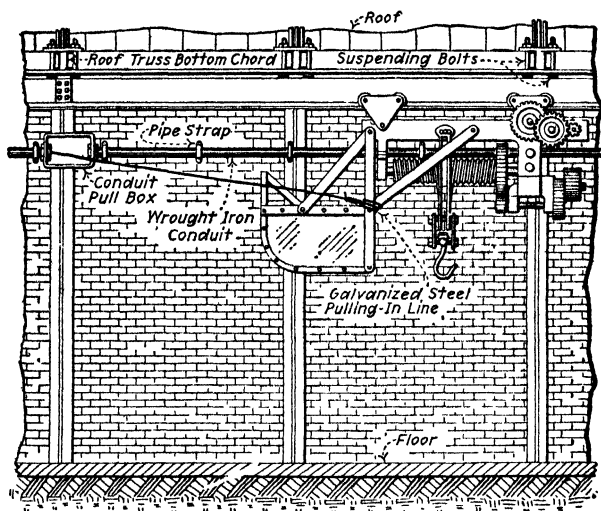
Pulling in conductors with a monorail crane. (Should the wheel slip on heavy pulls, two or three cranes may be coupled in tandem. If this fails, the pulling-in line should be re-routed so that pulling can be done by the crane hook.)
